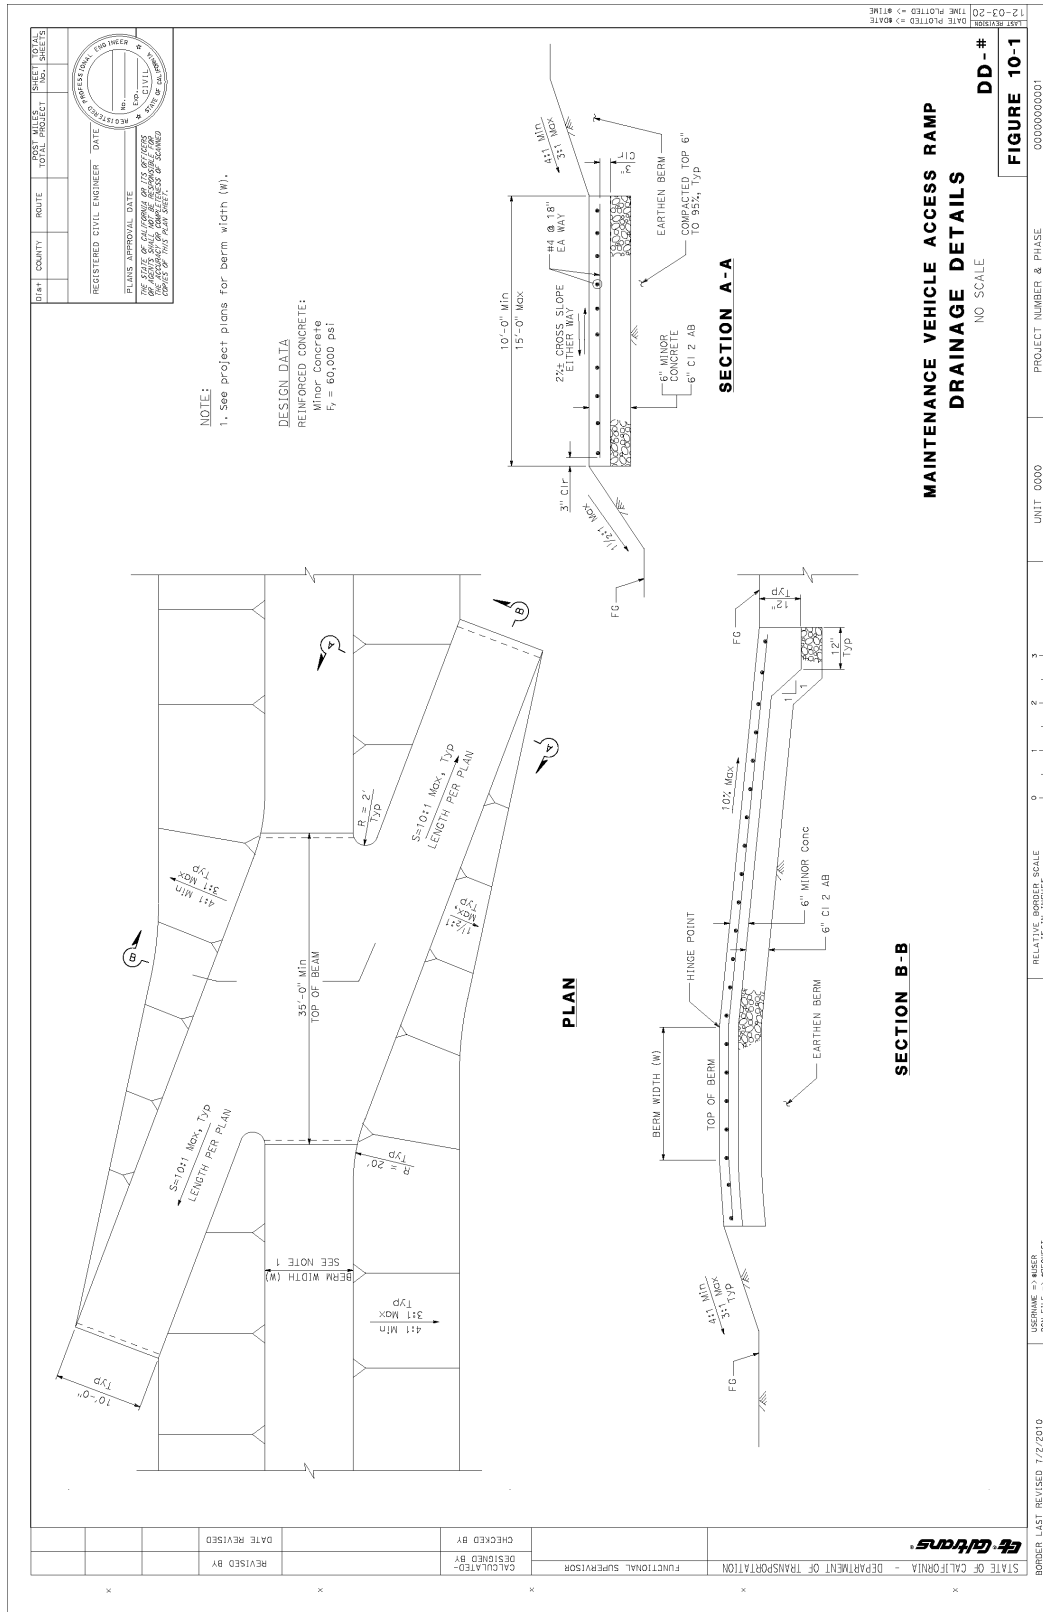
Construction Details Maintenance Vehicle Access Ramp
